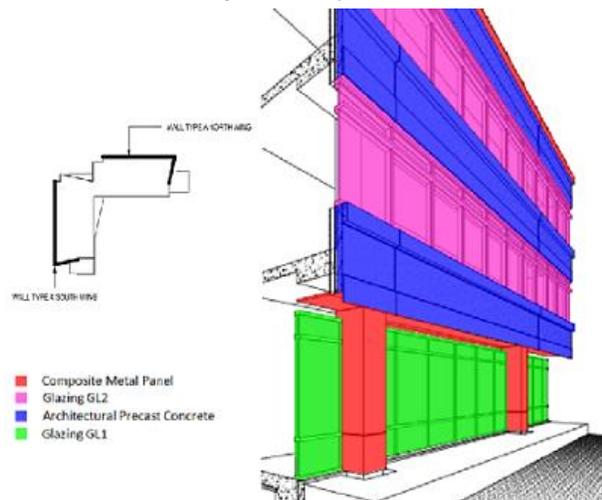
Main Façade Layout for Building Wings Courtesy of Gensler
